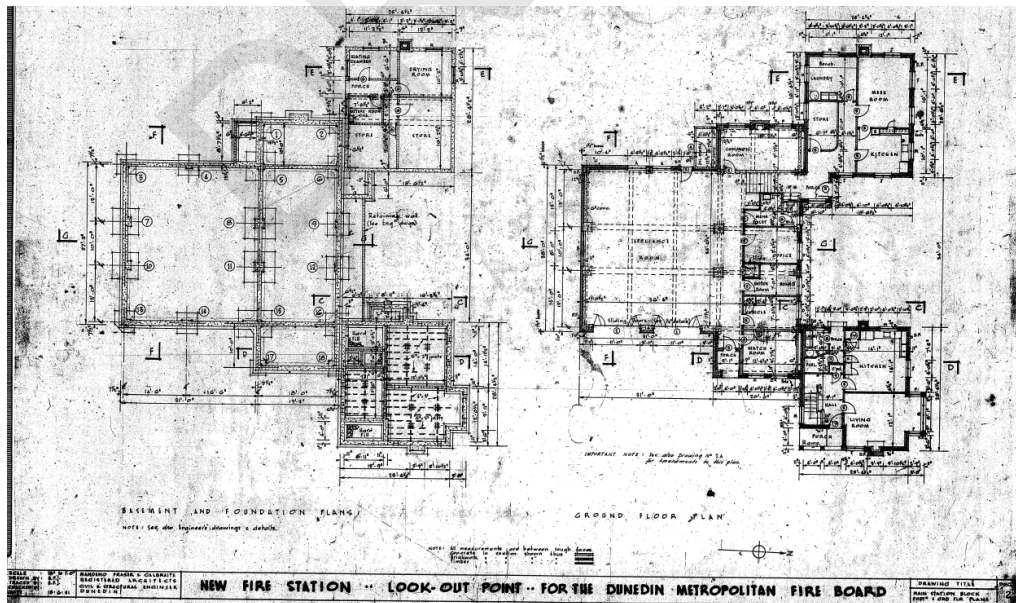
Ground floor and foundation plans of the Fire Station Block, Mandeno, Fraser and Galbraith, 1951.
